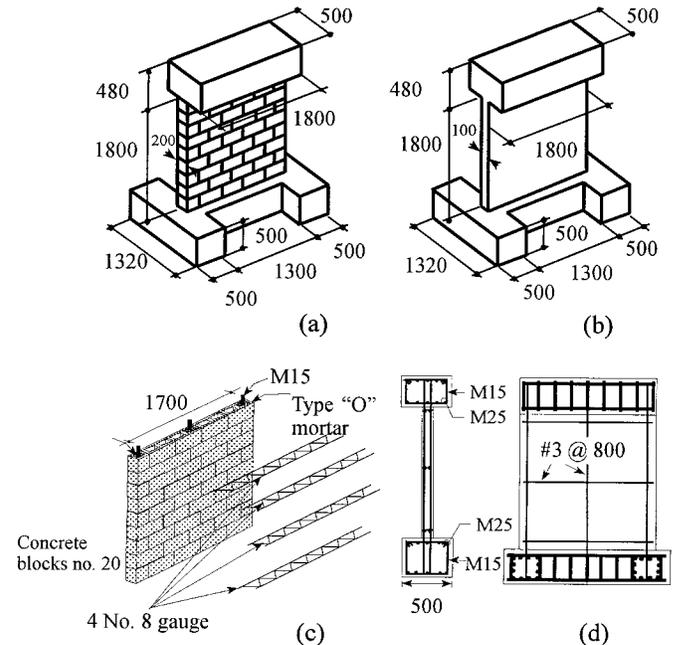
Geometry of: (a) Masonry Walls; (b) Reinforced Concrete Walls; and Reinforcement Layout for (c) Wall 10; (d) Wall 11
